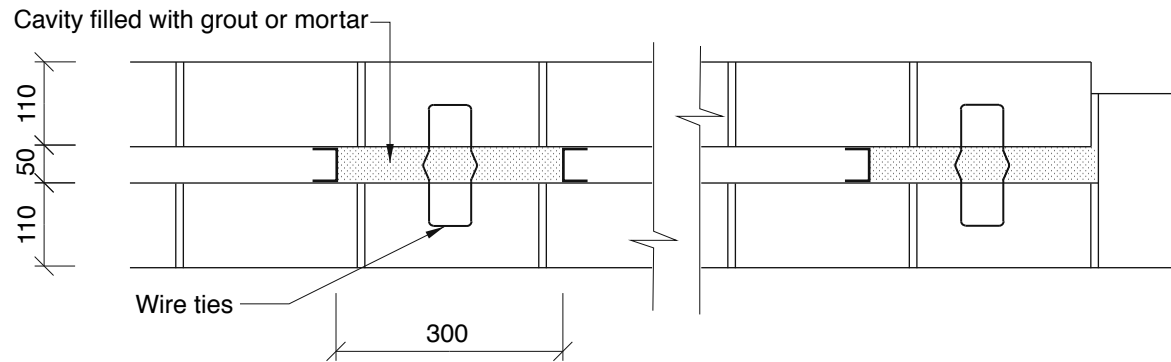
DETAILS OF Composite Masonry Mullions⁽⁷⁾
